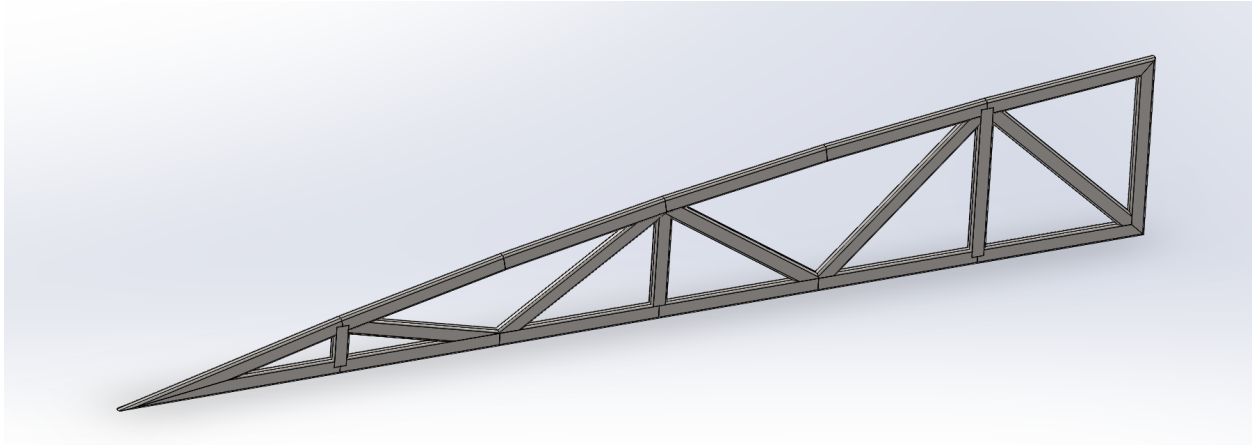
A Unit of the Initial Trussing Constructed of Hollow Rectangular Sections for a Double Guideway. The trussing consists of a Modified Warren Truss constructed of hollow rectangular sections adapted to fit under the slope of the canopy. A truss holds the racking at opposite sides of each unit.
